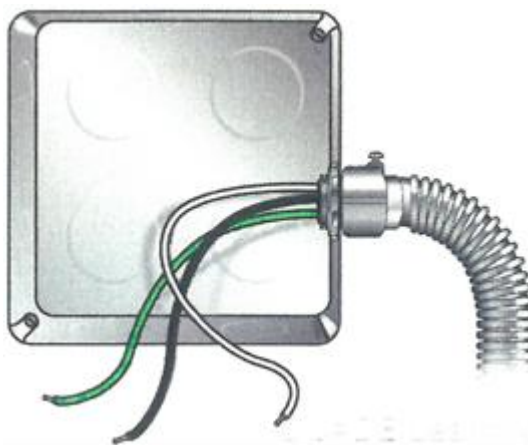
(Sample Picture)'GI Conduits for Lights
